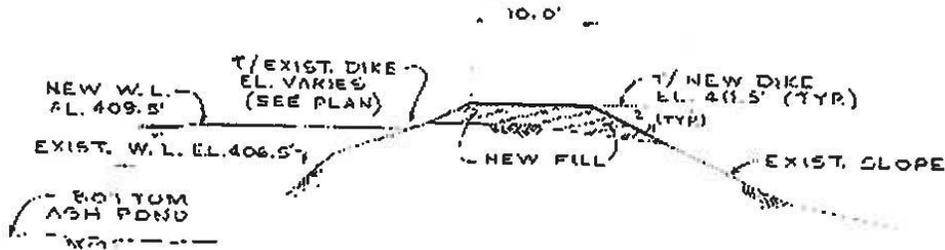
REPRESENTATIVE POND 3 EMBANKMENT SECTIONS
